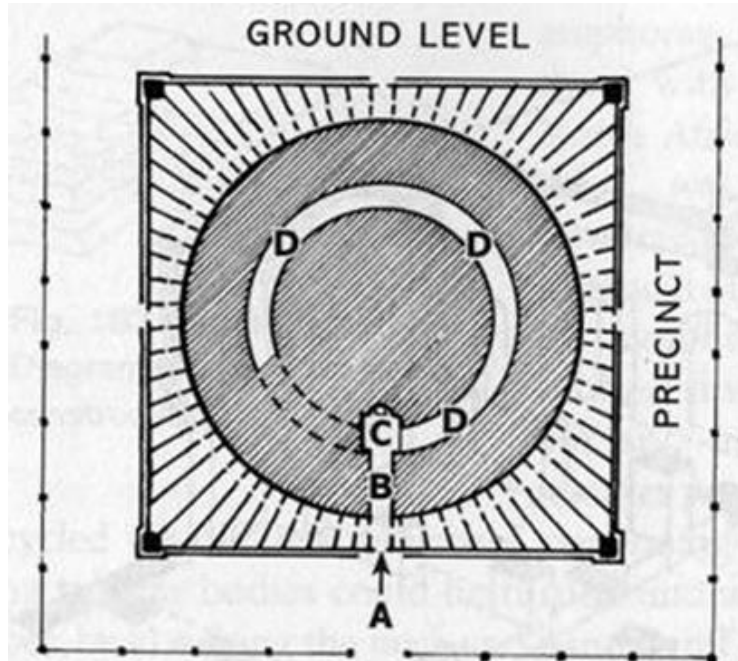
Amanda Claridge; Reconstruction of the floor plan of Hadrian's Mausoleum (1998)
